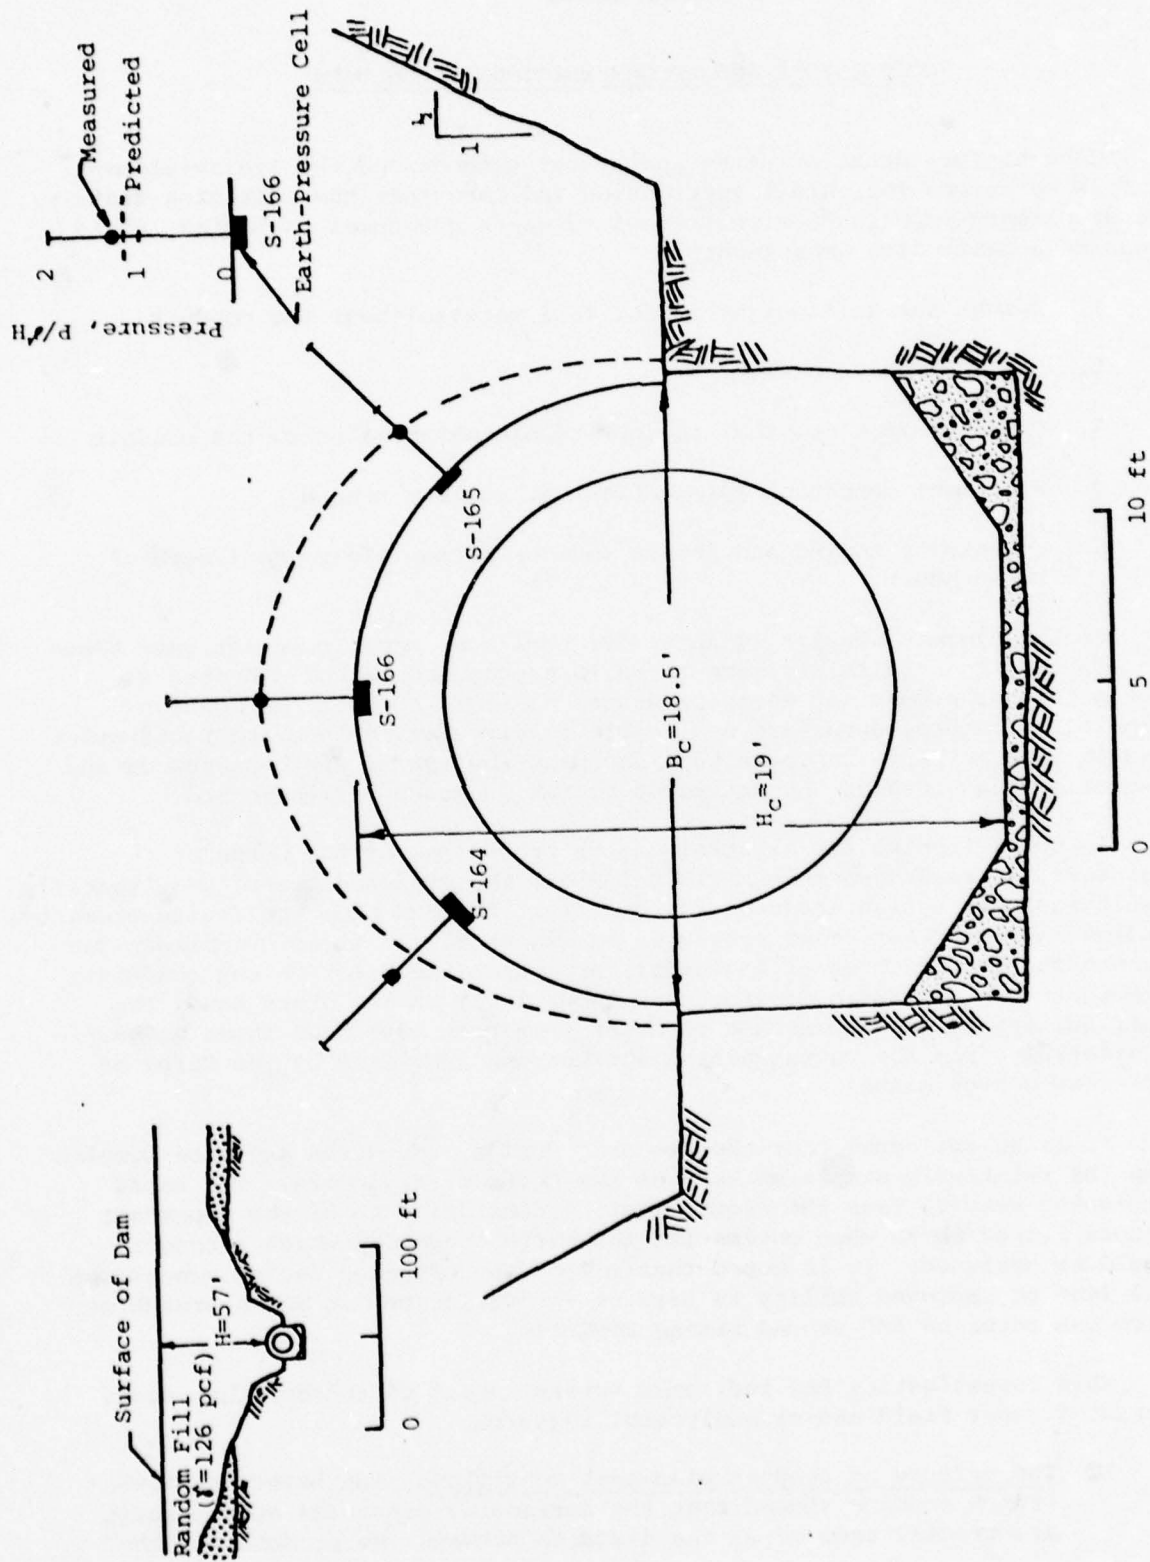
EARTH PRESSURES AT END OF CONSTRUCTION, INSTRUMENT STATION 21+54W, LAKE KEMP DAM
